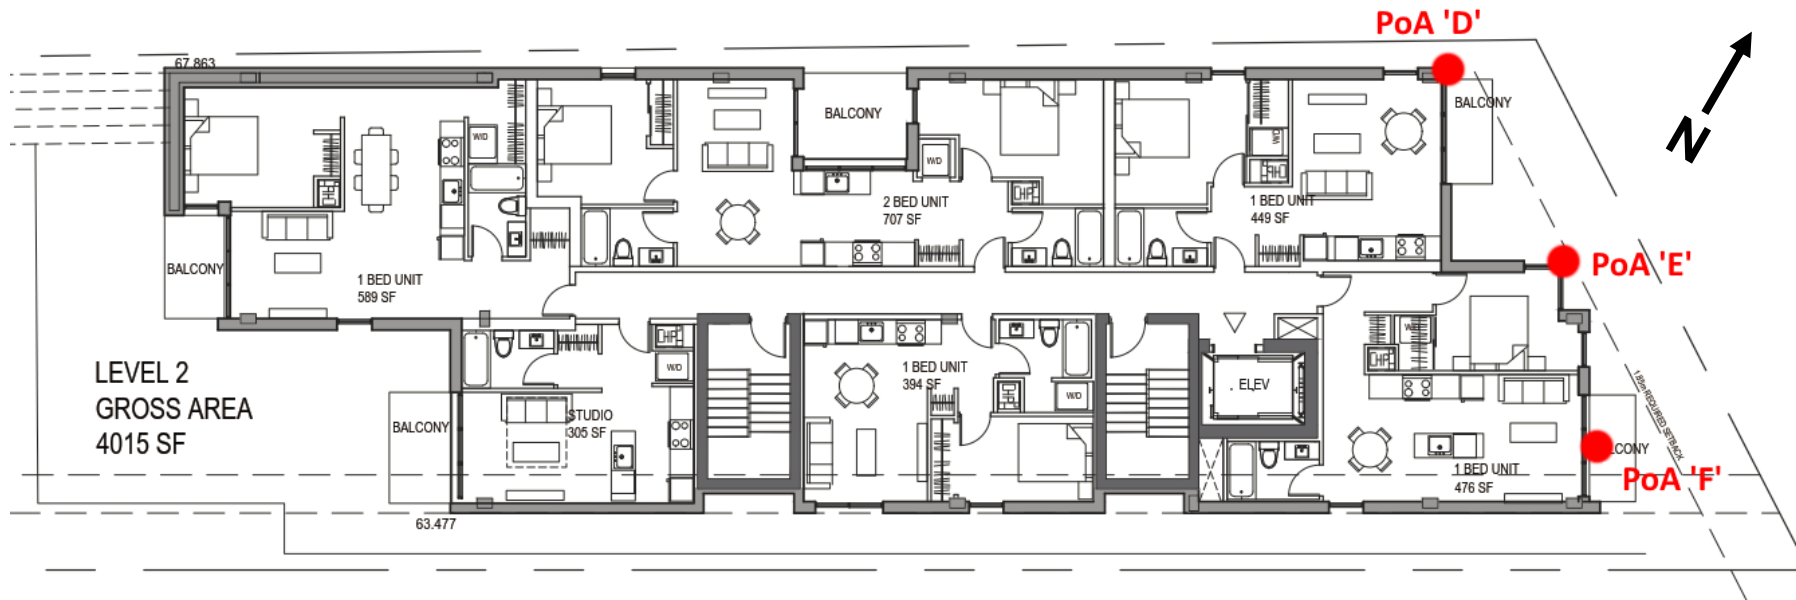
Site plan showing location of Points of Assessment PoA 'D' to 'F' on the second level.
